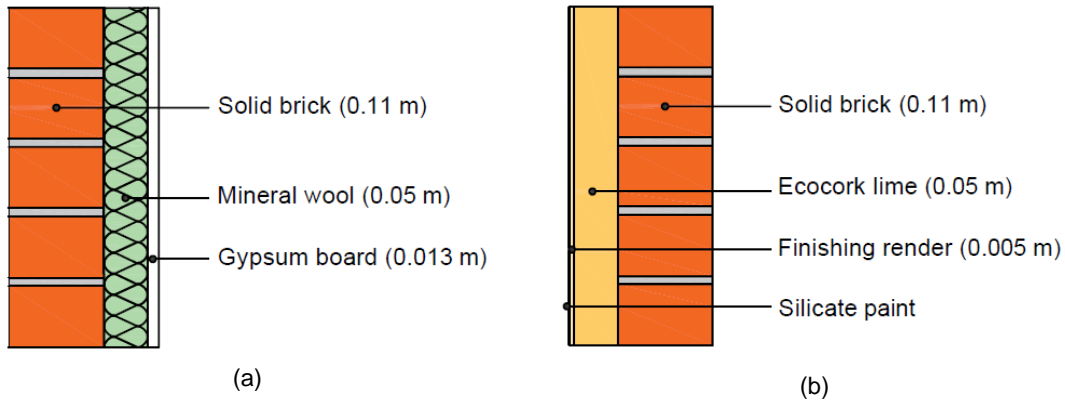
Cross-section of: a) wall test specimen A; b) wall test specimen B.
